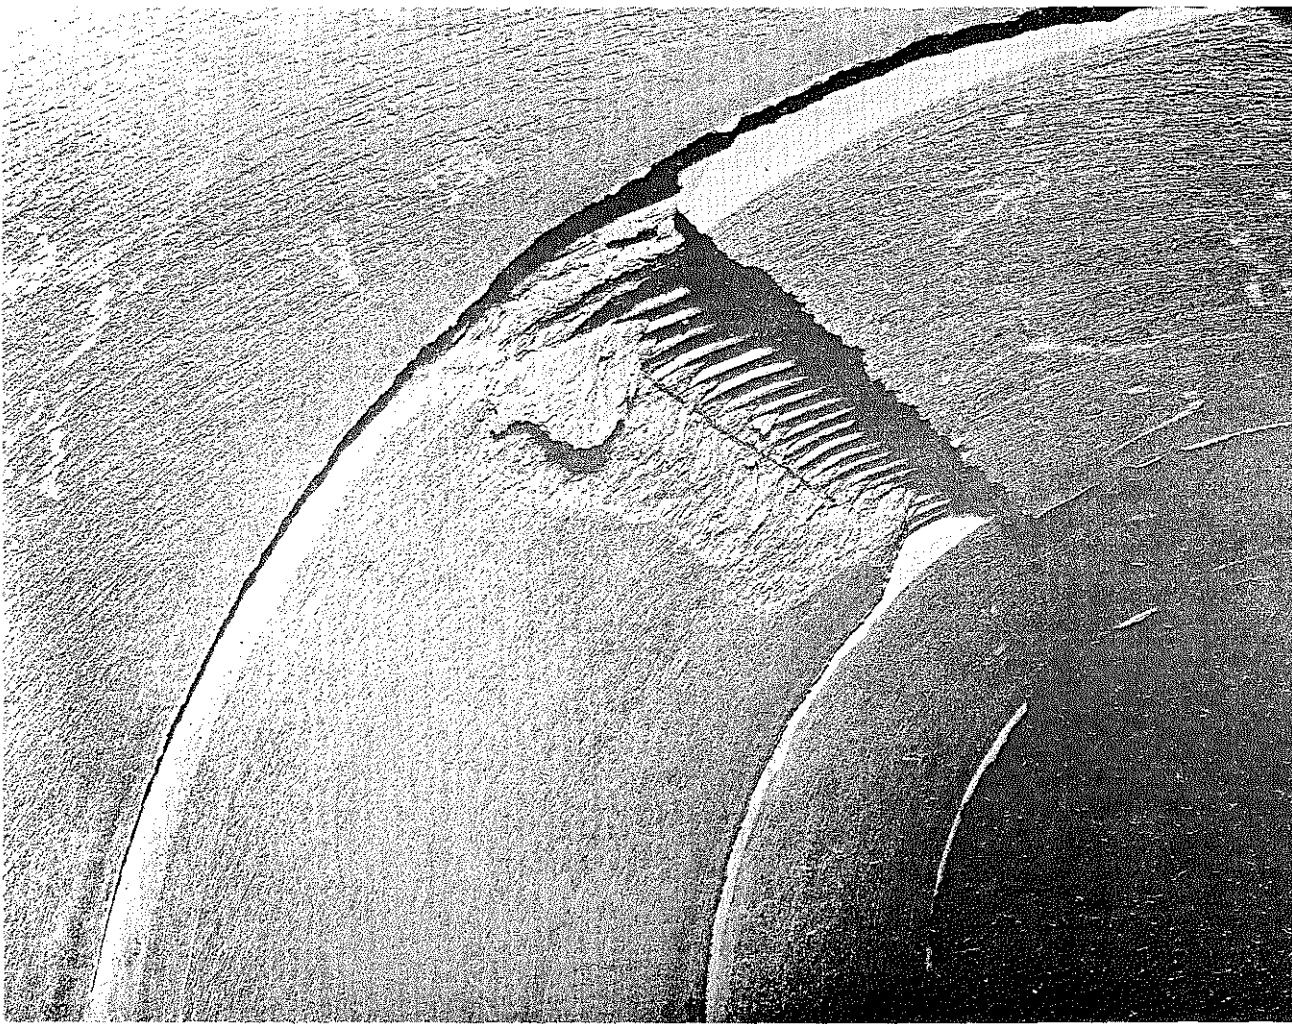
Failure in Bottom of 54-inch Culvert Under a 32-foot Fill, Station 1633 + 30L, I 64-3(7)35, Shelby County.
